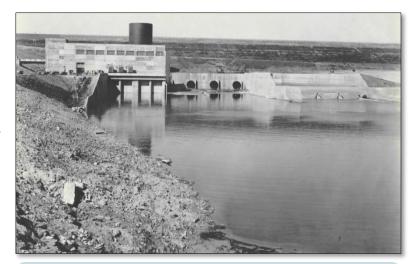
March 17, 1944 photograph of the powerhouse (left), outlet works (center and right), and stilling basin (foreground) with dam embankment in the background.
